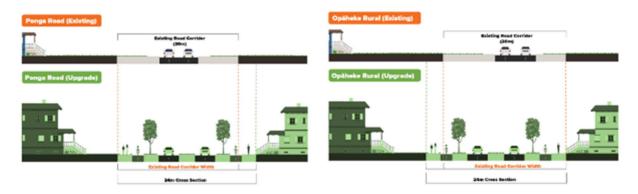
Indicative Future Corridor Design – Öpäheke Road and Ponga Road
